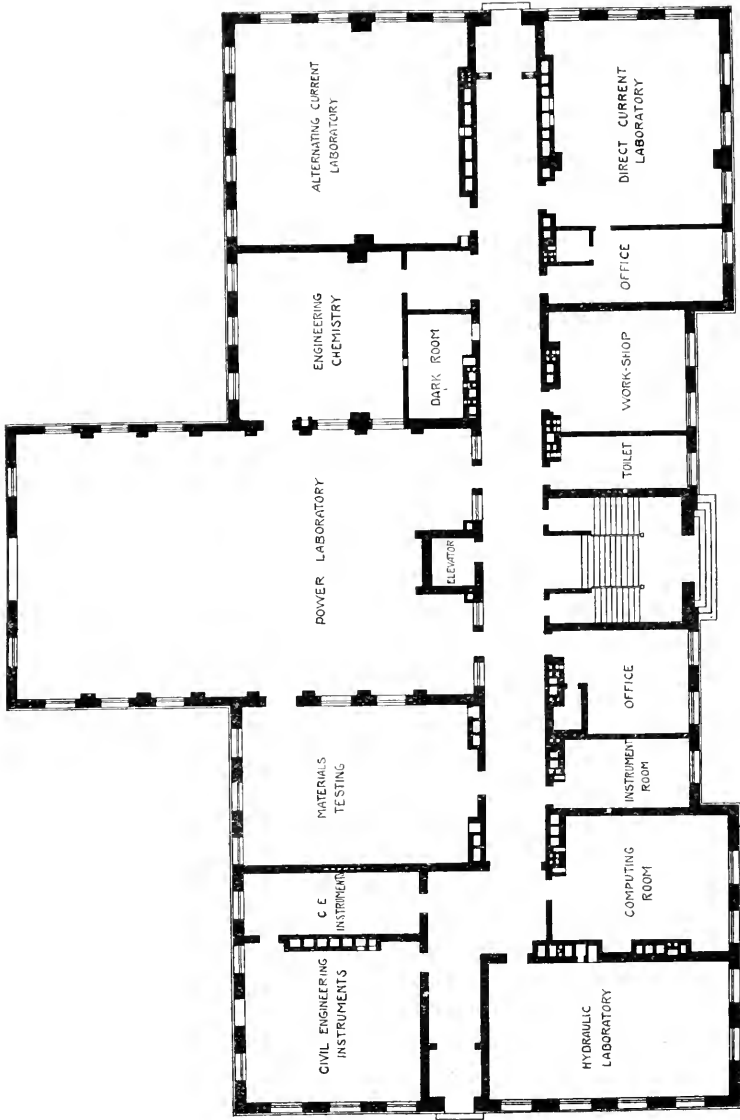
GROUND FLOOR PLAN OF THE R. E. OLDS HALL OF ENGINEERING.
